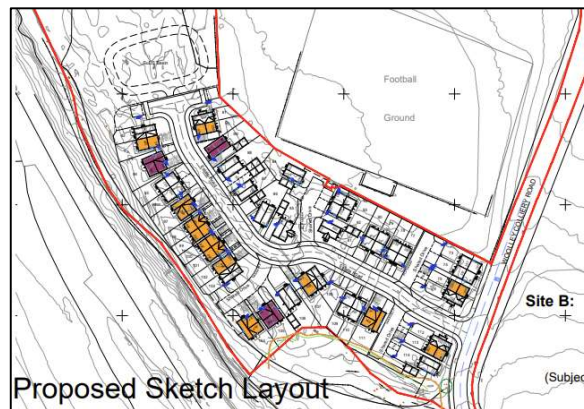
Southern Site - Proposed site plan NTS (Source: PRA Architecture Proposed Sketch Layout, dated 31.07.2024)
